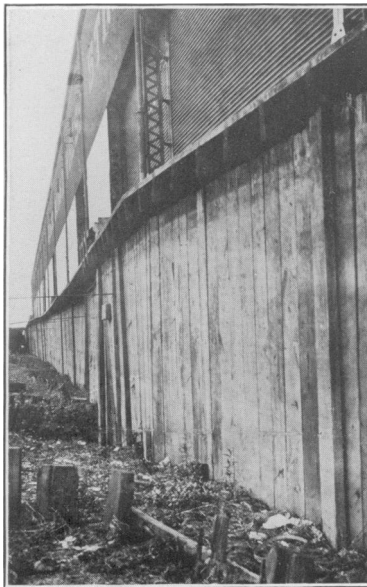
BULKHEAD IN REAR OF PRESS STREET DOCK, SHOWING IRREGULARITIES DUE TO EARTH MOVEMENT.
